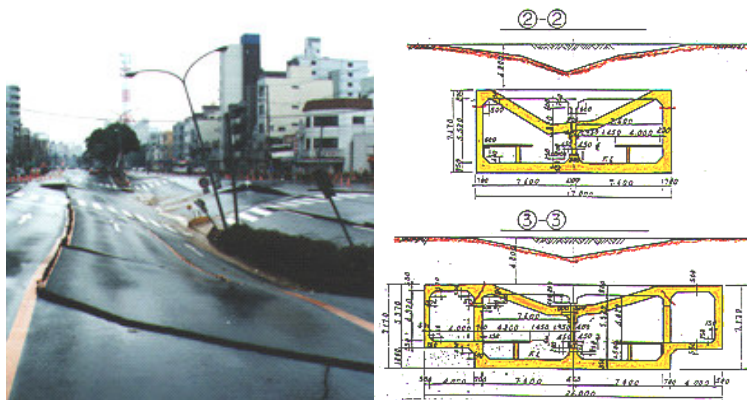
Scheme of collapse and settlement over Dakai tube station, Kobe, Japan
